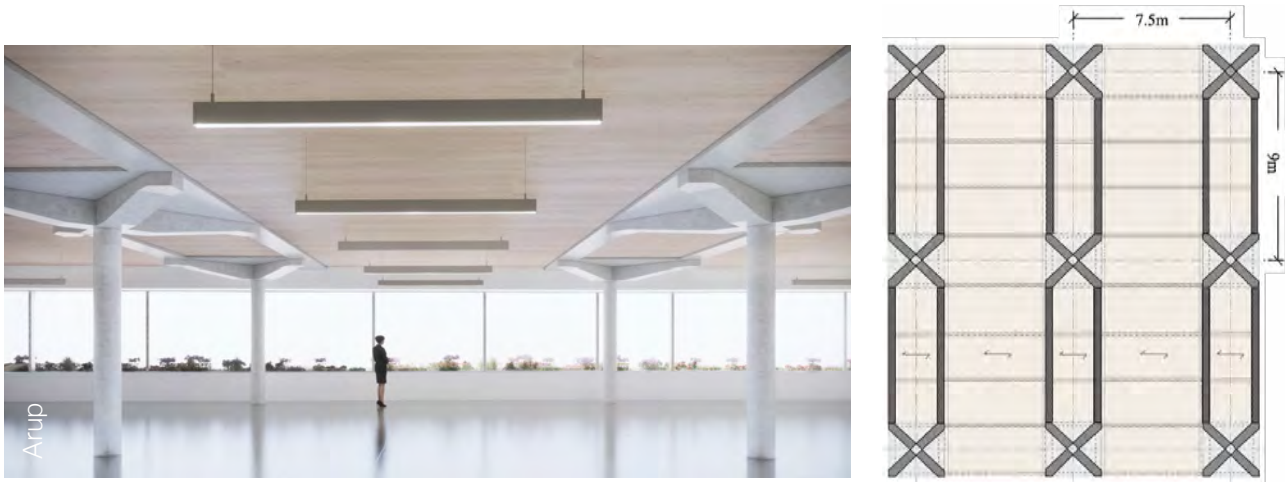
Hybrid reinforced concrete and timber frame proposal for an office building in London
